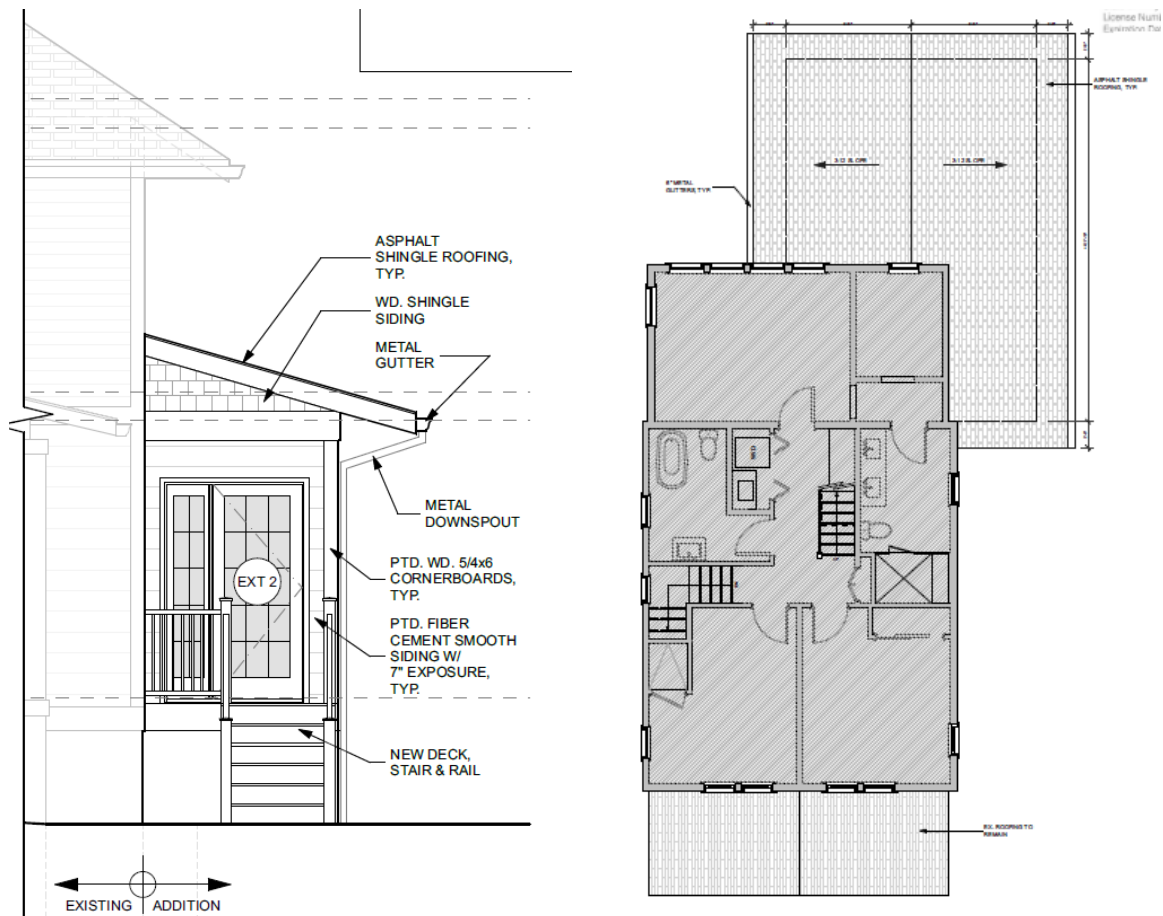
Unobscured front elevation of the proposed addition (left) and roof plan (right).
